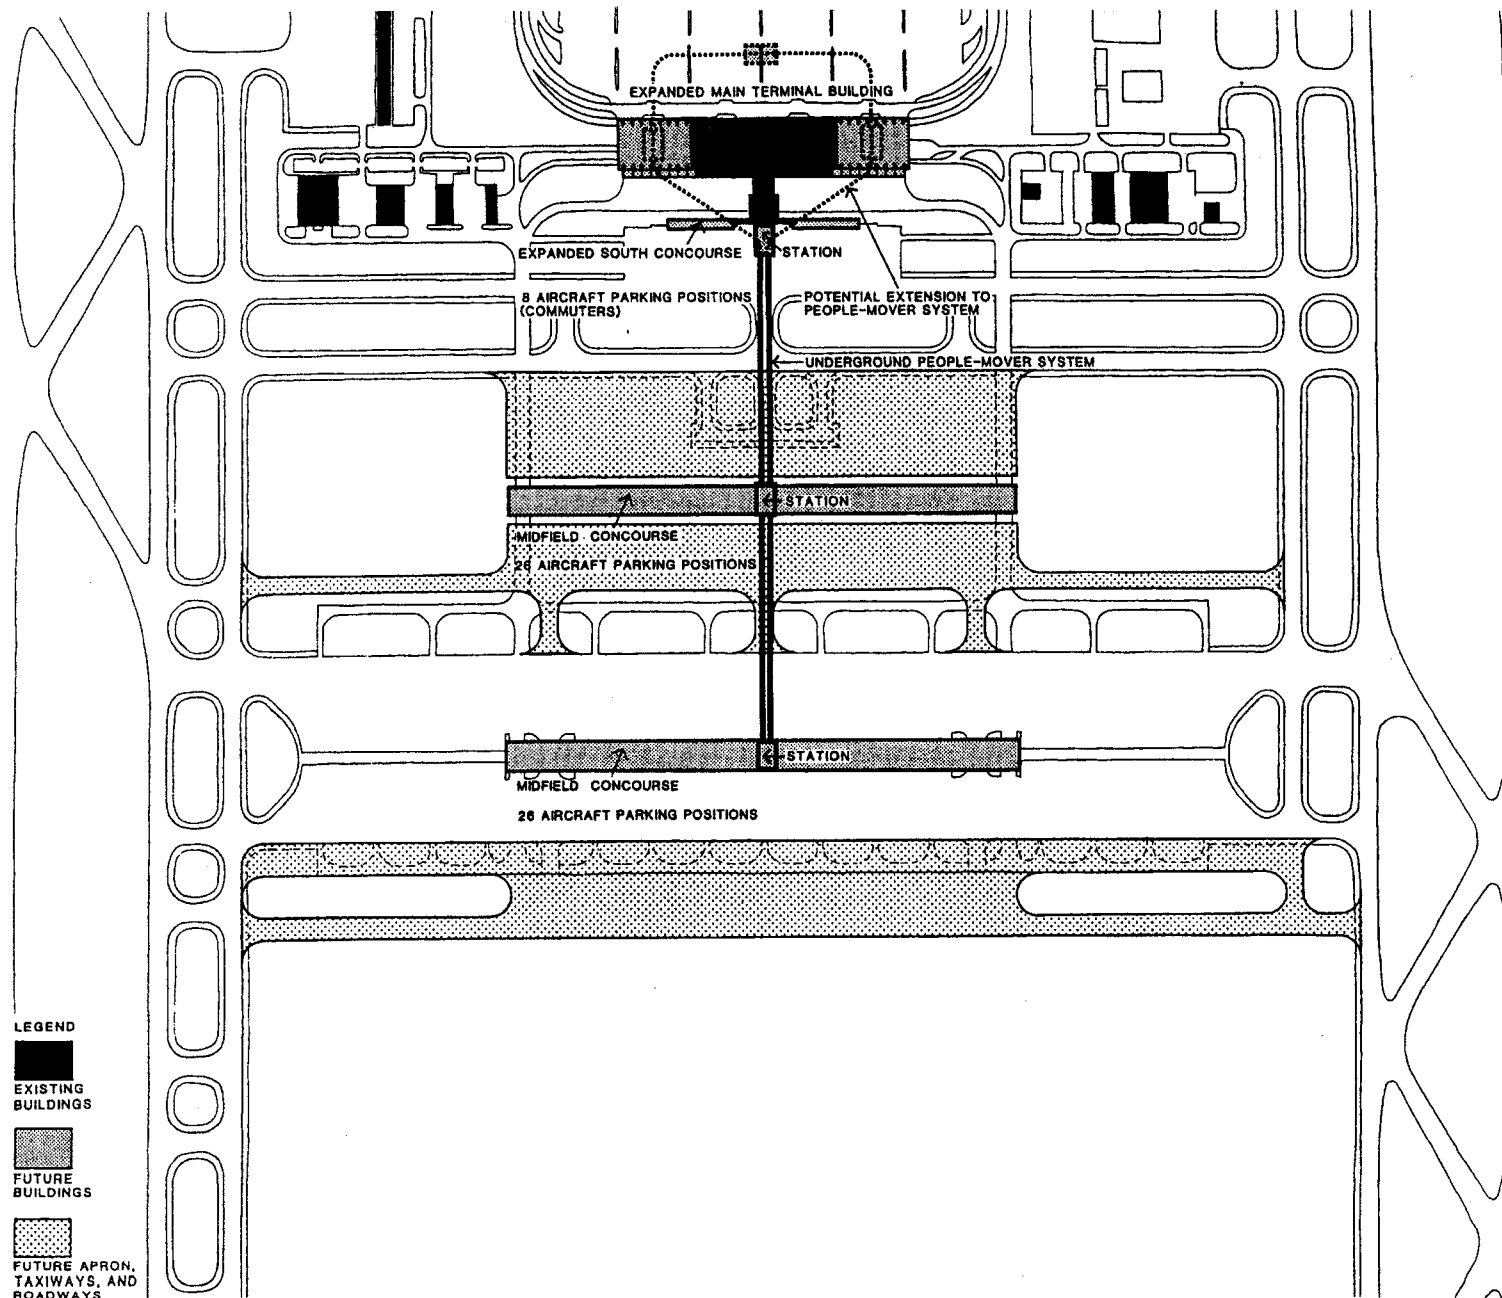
Washington Dulles International Airport Master Plan (1985): Terminal Concept E.
